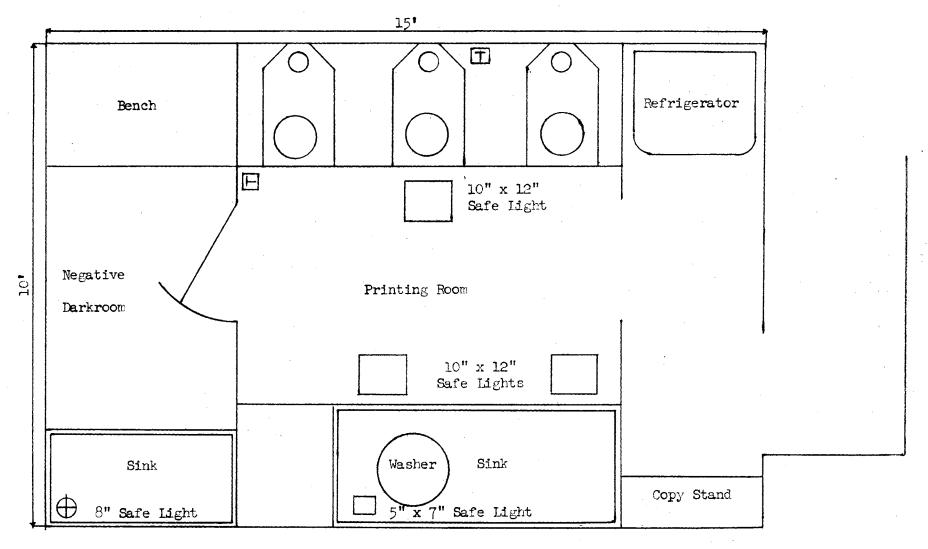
DARKROOM FLOOR PLAN - NORMAN DAILY TRANSCRIPT (SCALE 1/2" = 1")
